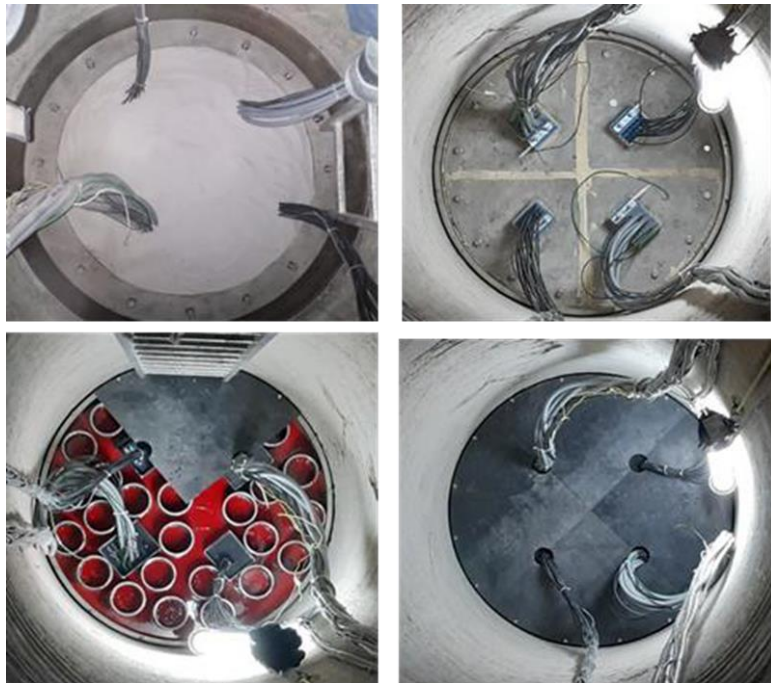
Installation of the cables sealing lid in Shaft 2
